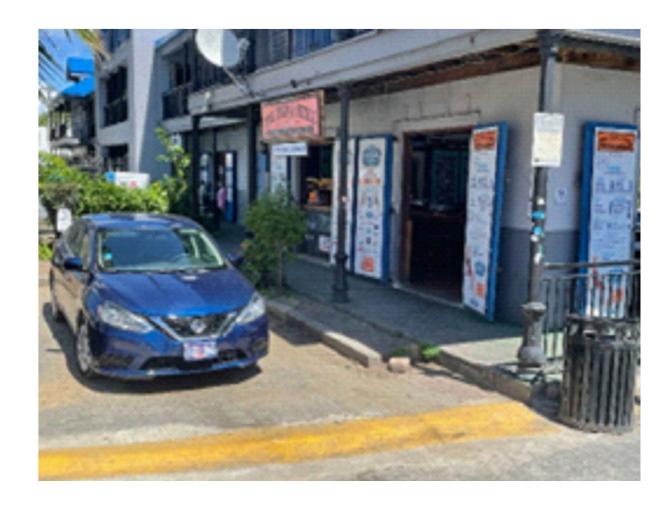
VIEW OF NORTH WEST CORNER OF BUUILDING A FOR LOCATION OF PROPOSED HC PARKING SPACE AND HC RAMP UP TO 1ST FLOOR FRONTING TAP & STILL RESTRAUNT
